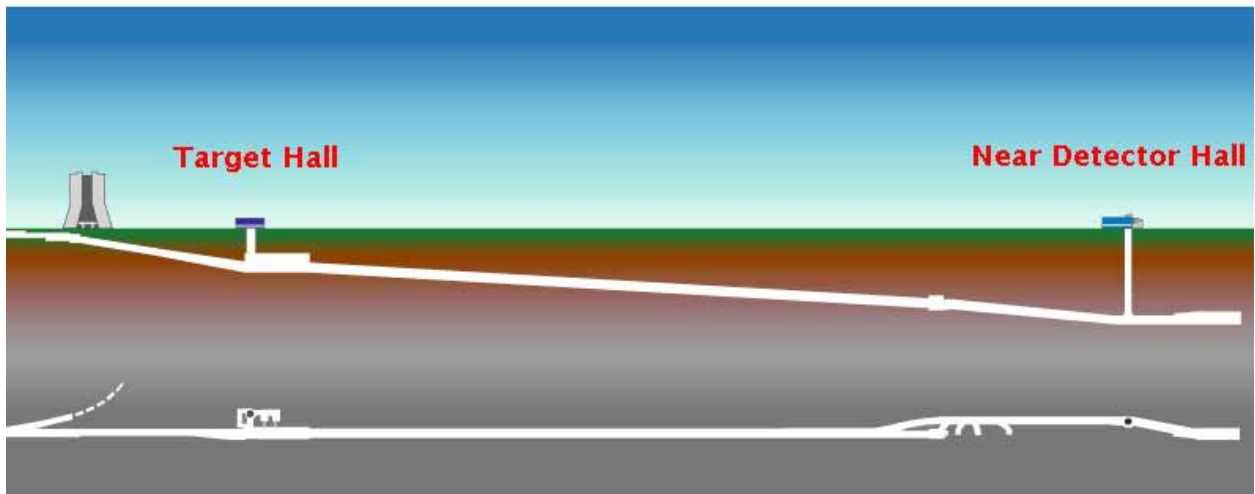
Plan (bottom) and elevation (top) views of the NuMI beam line.
